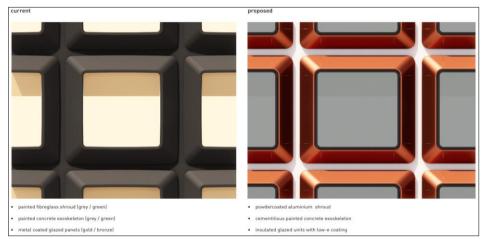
Existing building in diagram on left, and PreDA proposed building on right.
